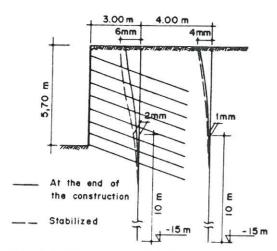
HORIZONTAL DISPLACEMENTS INSIDE AND BEHIND A NAILED SOIL WALL (Cartier and Gigan, 1983)
